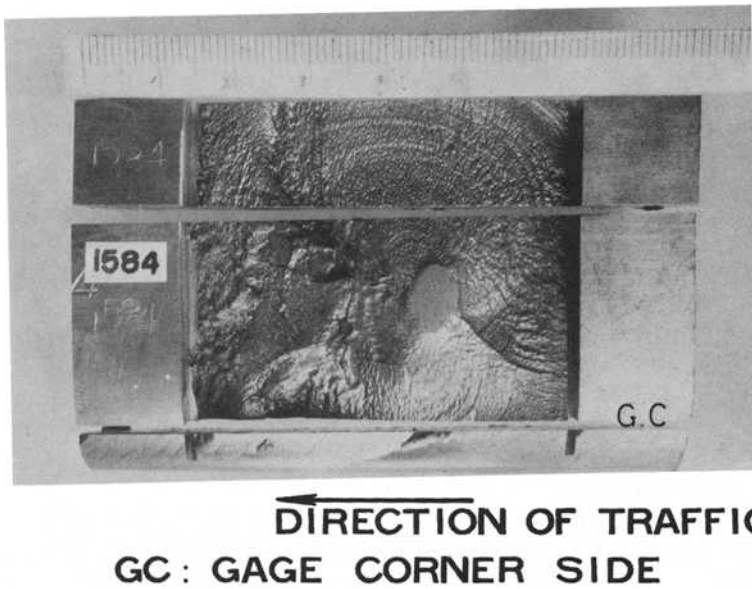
Fracture surface of horizontal crack revealed by separation of the surface layer.
